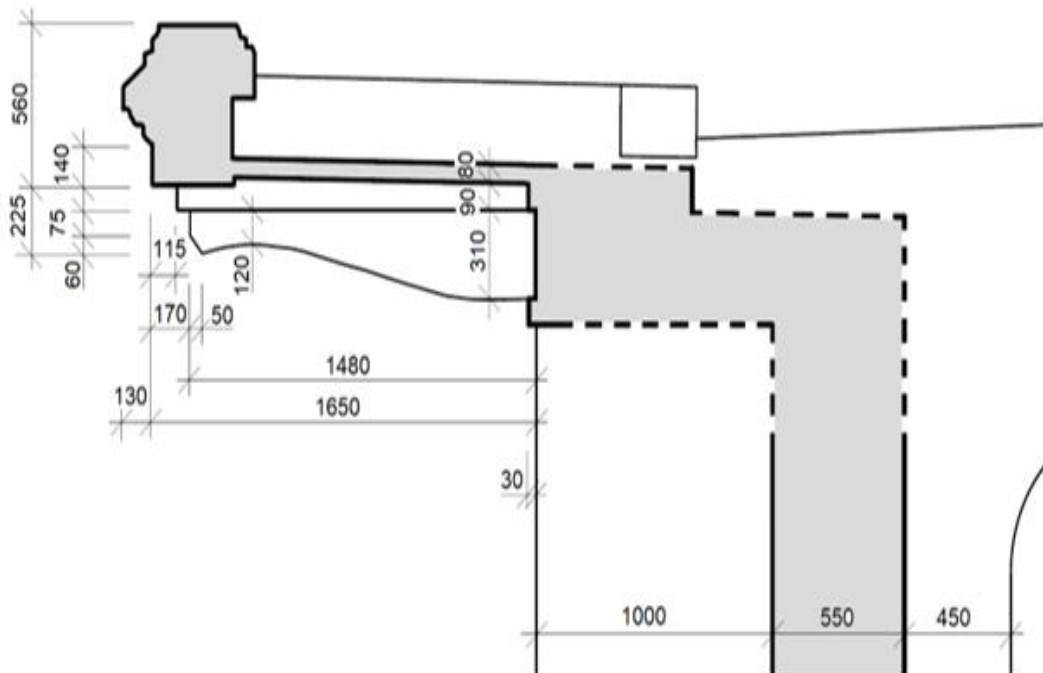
Cross-section of the bridge (the left half shows the section at the top, the right half shows the section above the pier).
